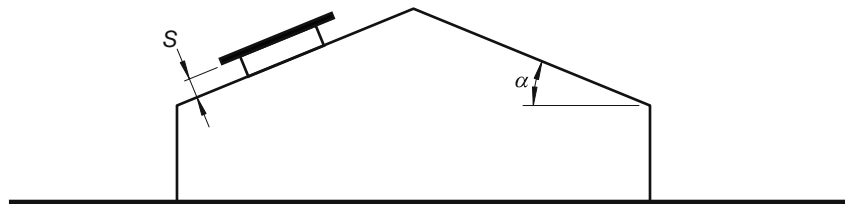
PANEL MOUNTED PARALLEL TO ROOF PLANE
